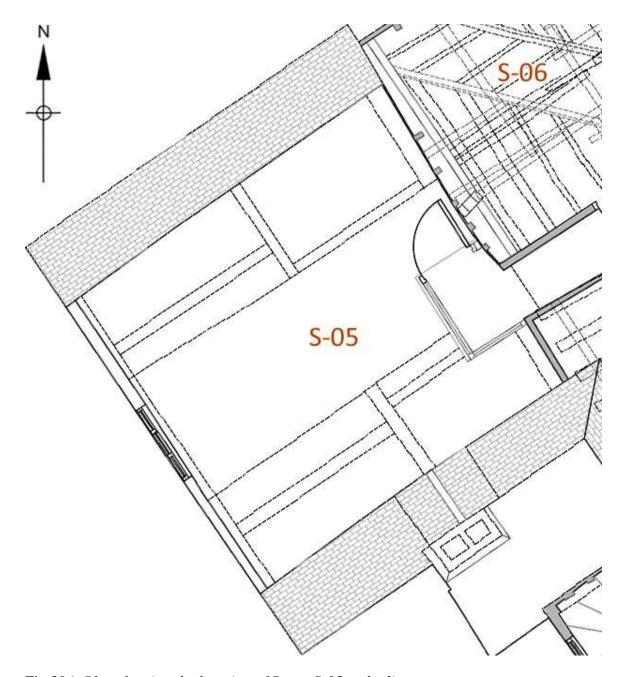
Plan showing the location of Room S-05 and adjacent rooms
